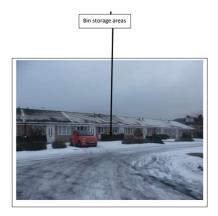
Demonstration of bin storage areas on another site belonging to the applicant
